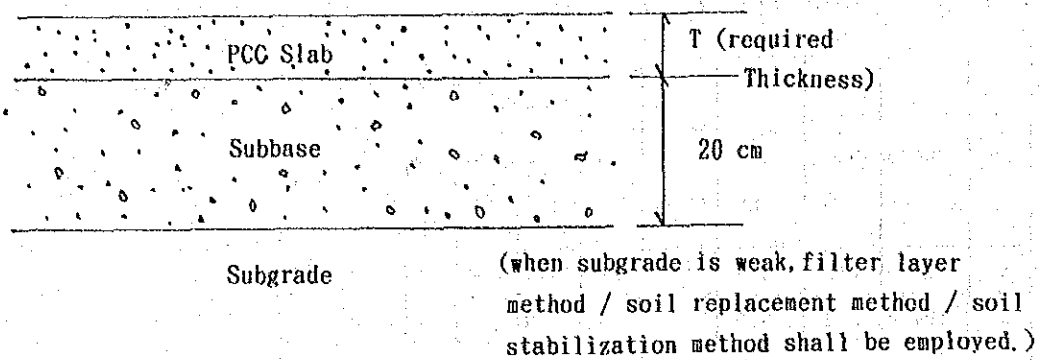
TYPICAL CROSS SECTION OF PCC PAVEMENT.
